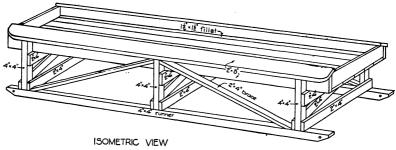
A well-constructed, portable feed trough (design no. 1173).
